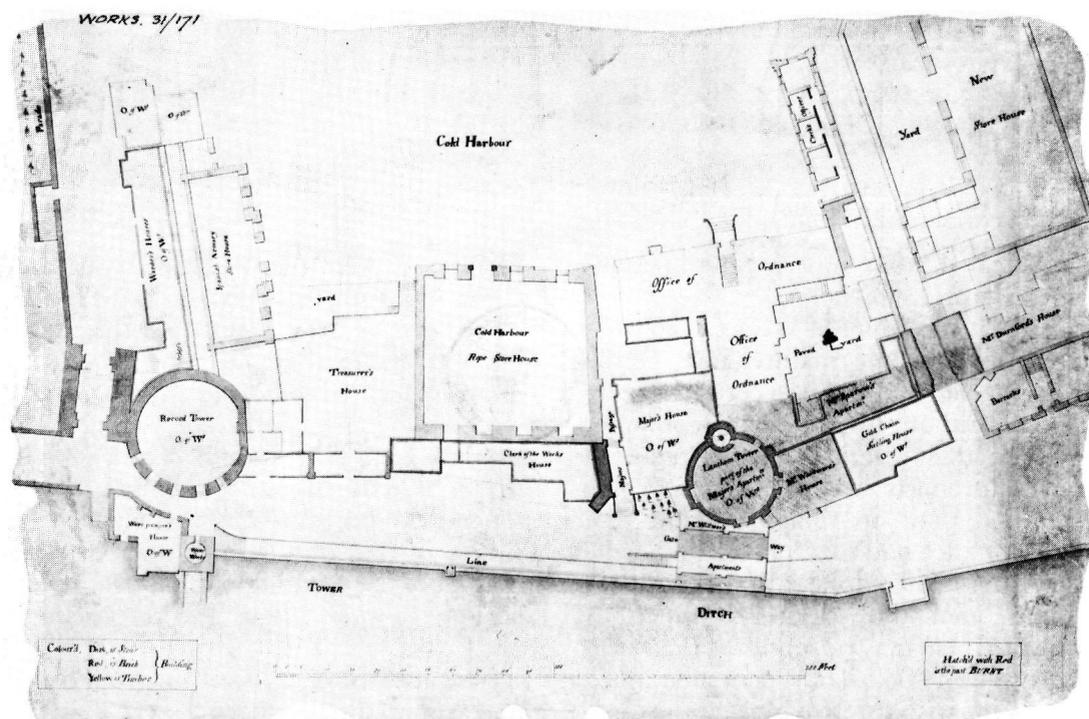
Ordnance plan showing extent of fire damage (hatched area) around Lanthorn Tower in January 1774.
